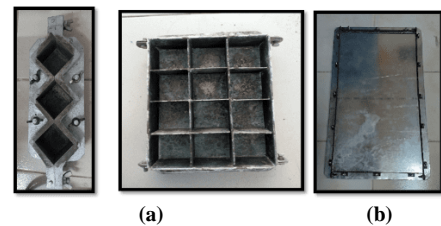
(a) 12-50mm cube mould made up of welded plain GI sheet; (b) 12 in. x 24 in. x 1/2 in. metal mould for wall cladding tiles
